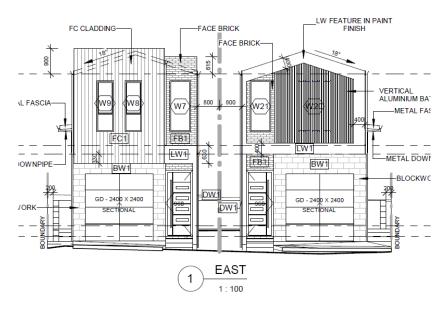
Extract of the architectural plans (Elevations) showing the proposed height of the dwellings
